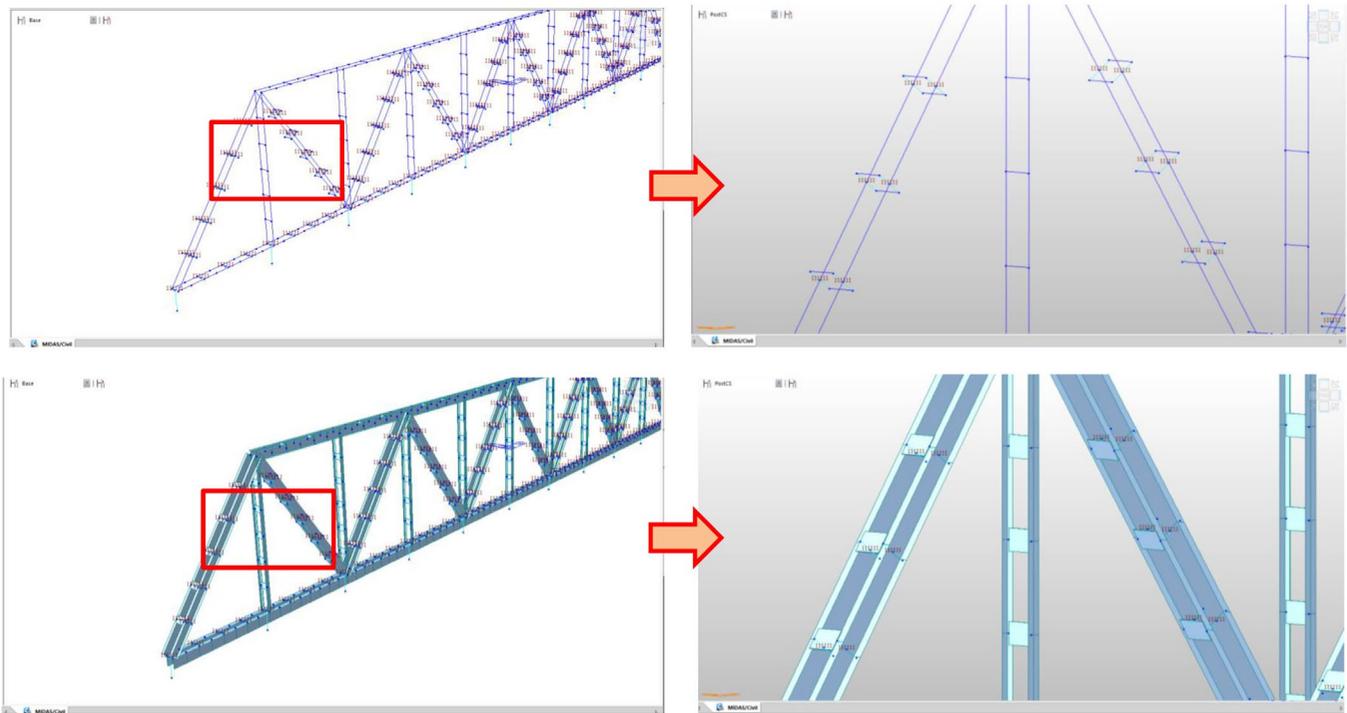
Detail of the diagonal and vertical truss element rigid-link and offset.
